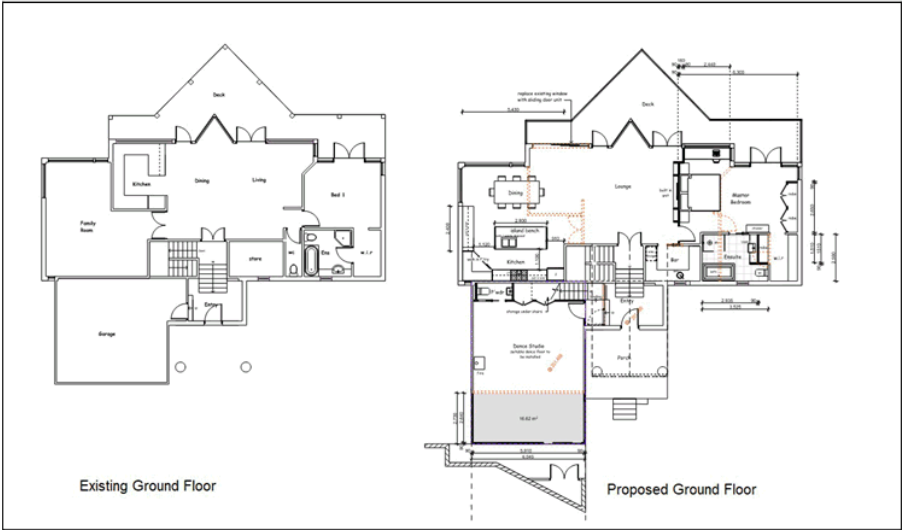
Existing and proposed ground floor plan (DuoDesigns, 2020)
